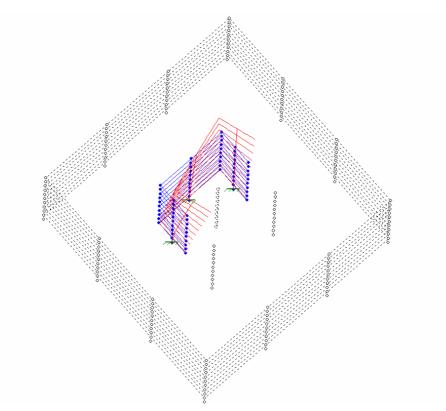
Core Wall Idealised with beam elements and rigid arms also showing deflection and twist due to eccentric lateral loading.
